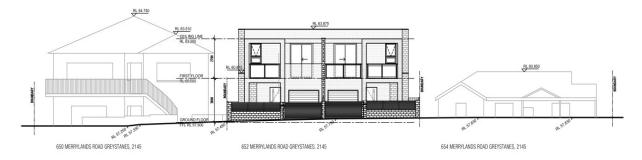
Streetscape perspective from Merrylands Road, looking south (Source: Cad Plans Pty Ltd, 2019)
